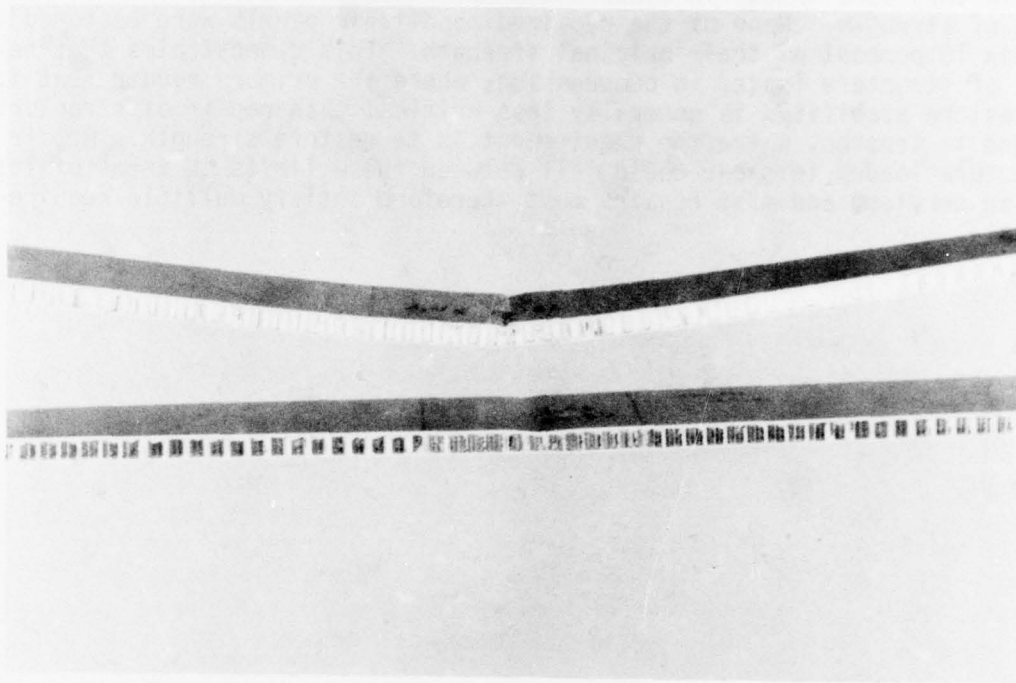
Typical Failure of Sandwich Panel Beam Shear Specimen
